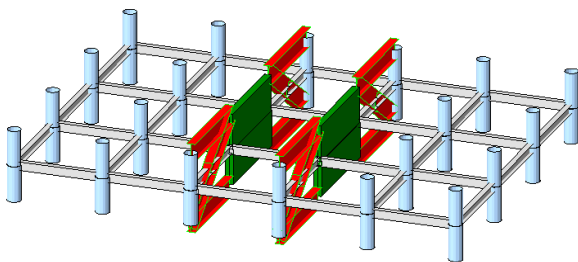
Layout of core outrigger system(Outrigger is installed in line 3 and 4)
